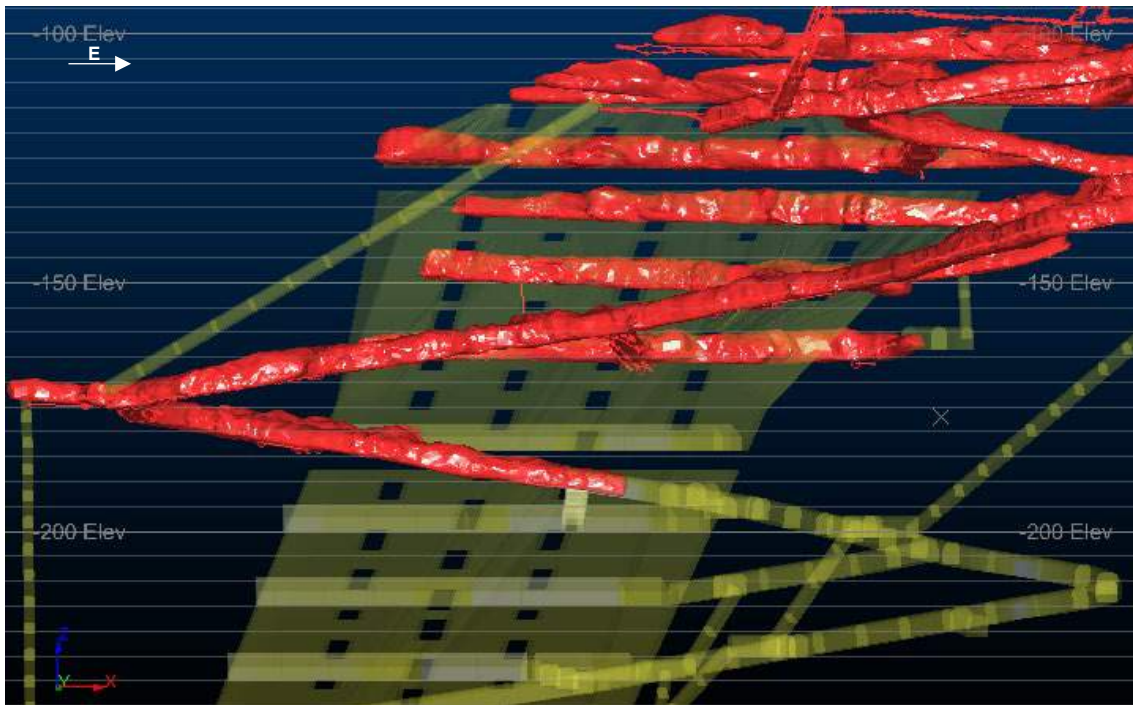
View looking North. Mining at the Brás vein. Excavated drifts are shown in red and planned mine development (including planned pillar locations) is shown in yellow
